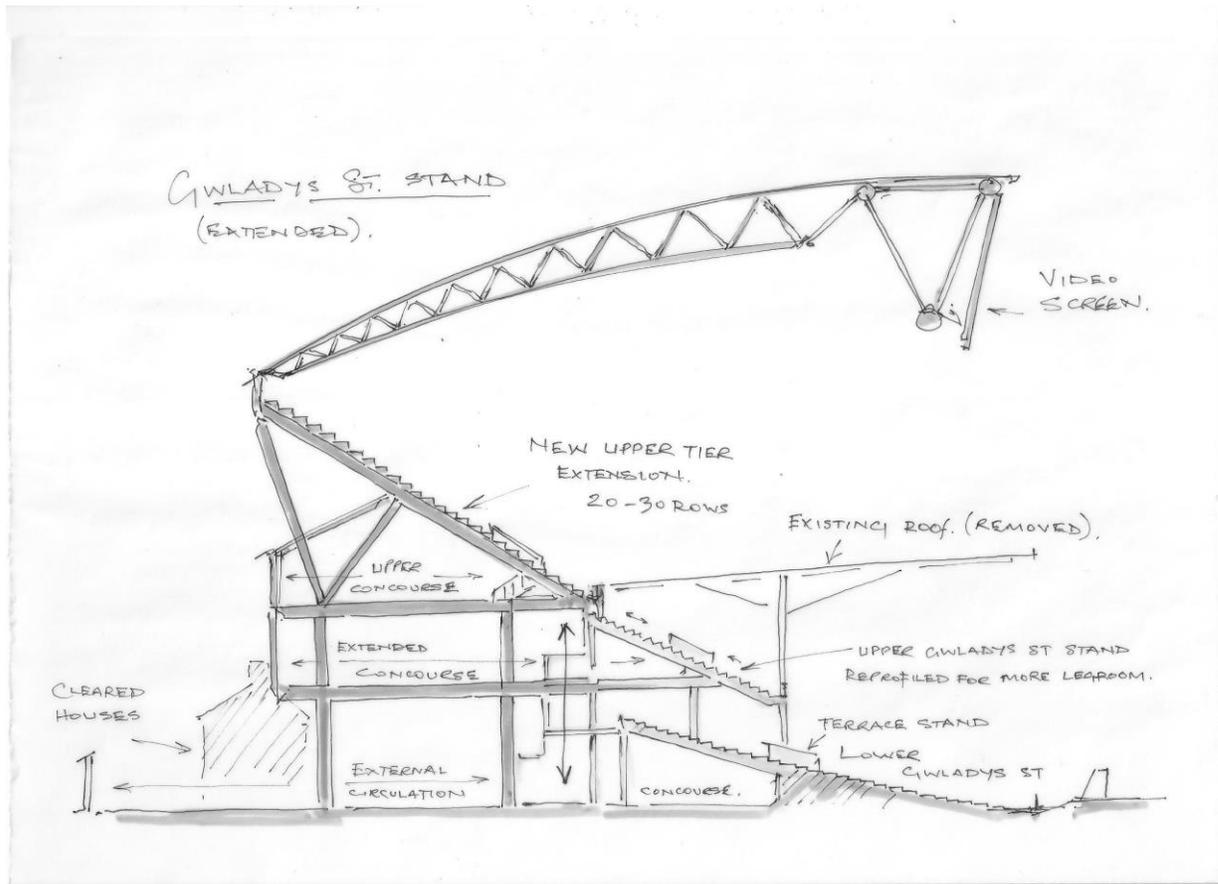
New Gwladys Street stand with 'Skyboxes' built into roof-truss.
